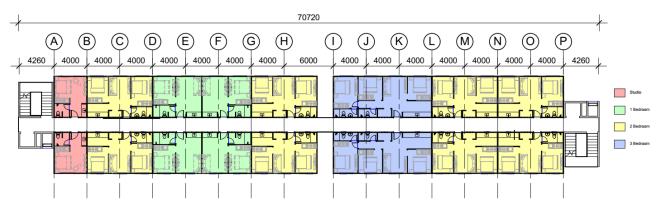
Affordable Unit Typology - Linear Floor Plan Option 1
